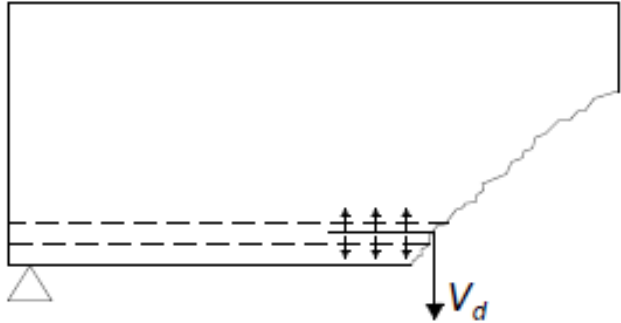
Inclined cracks in a reinforced concrete beam
